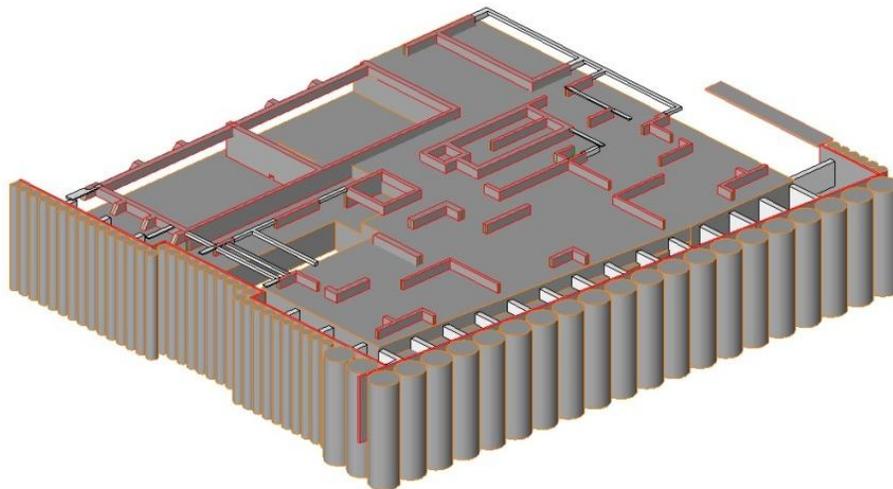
Continuous Bored Pile (CBP) wall and Mat Foundation (Image courtesy of TYLin)
